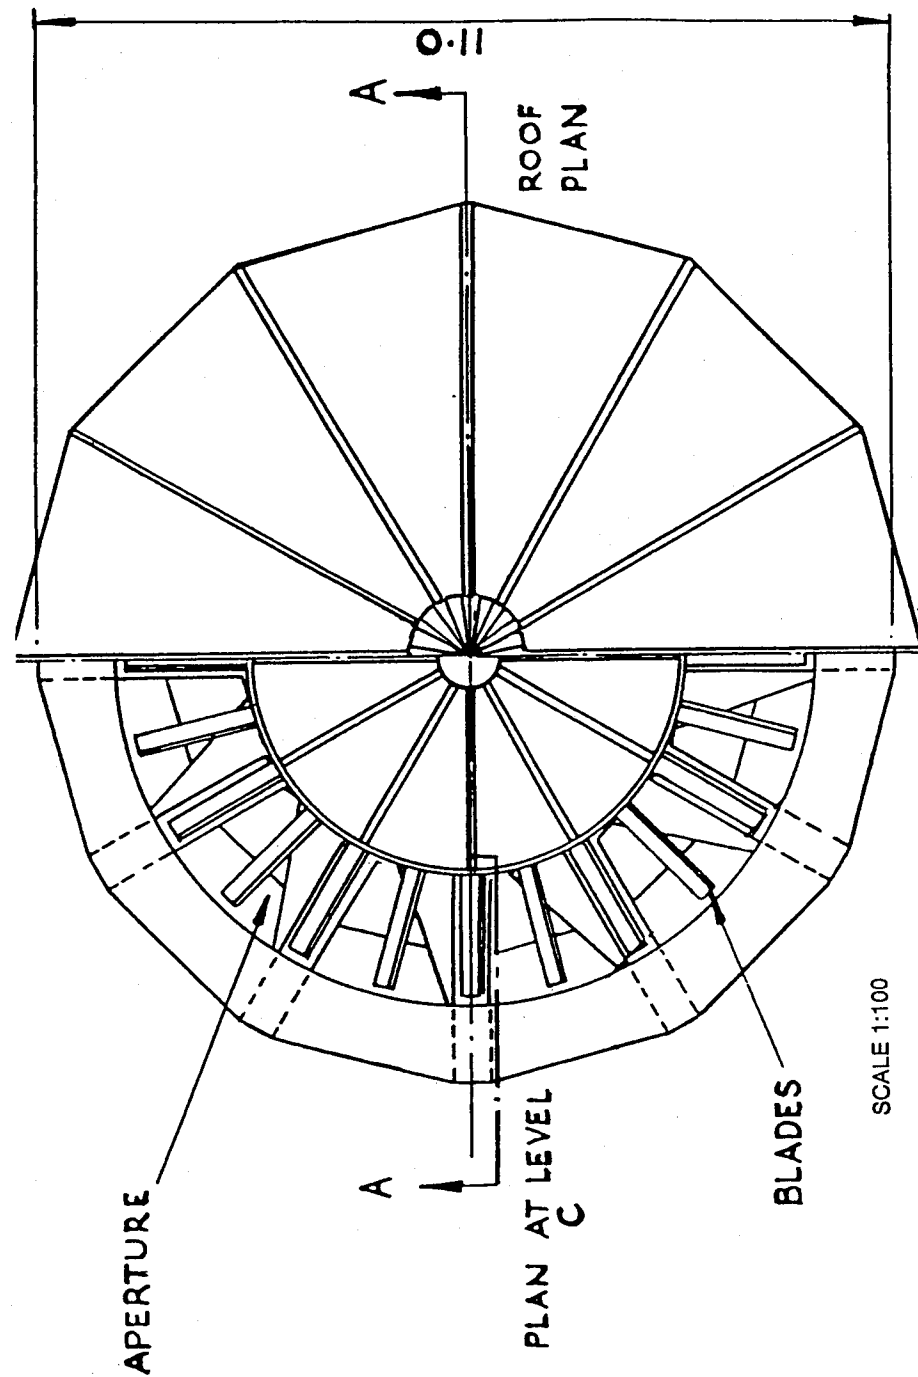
Wind Generator - Scheme A, Roof Plan View & Section at level C. (All dimensions in metres), Copyright © K.M.Davies 1-1-92.
